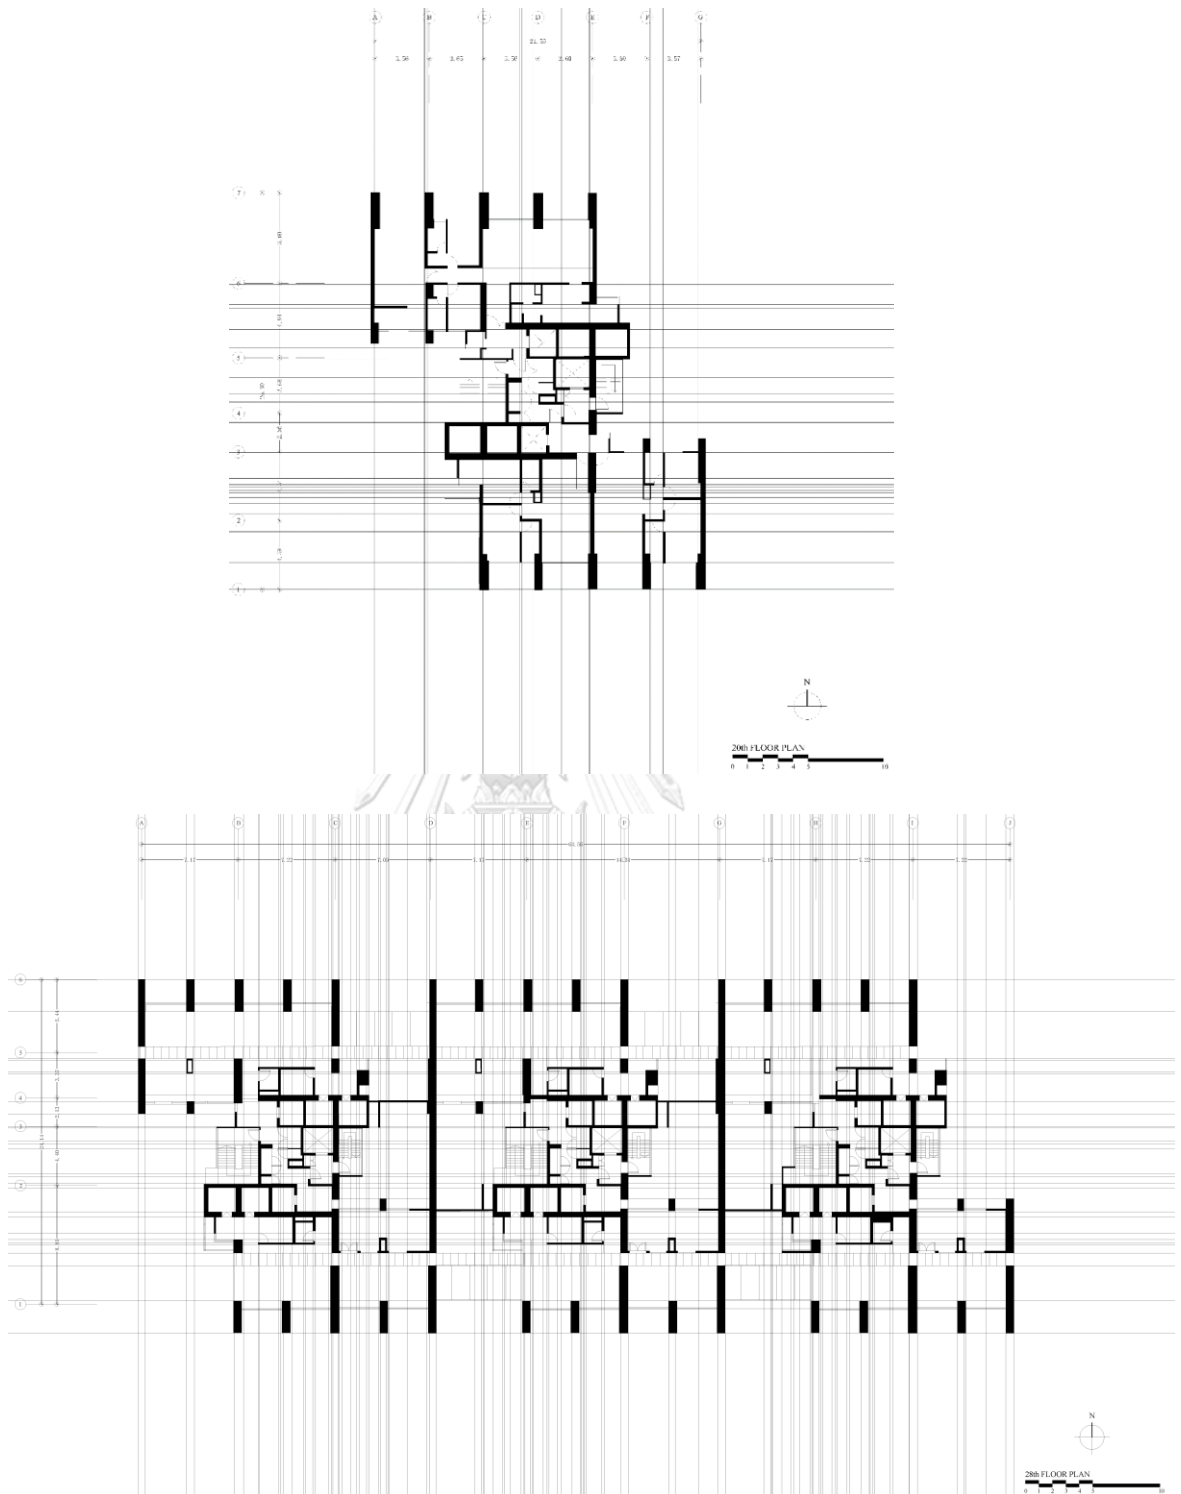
20th and 28th floor plan of The MET Condominium, redrawn by the author.
